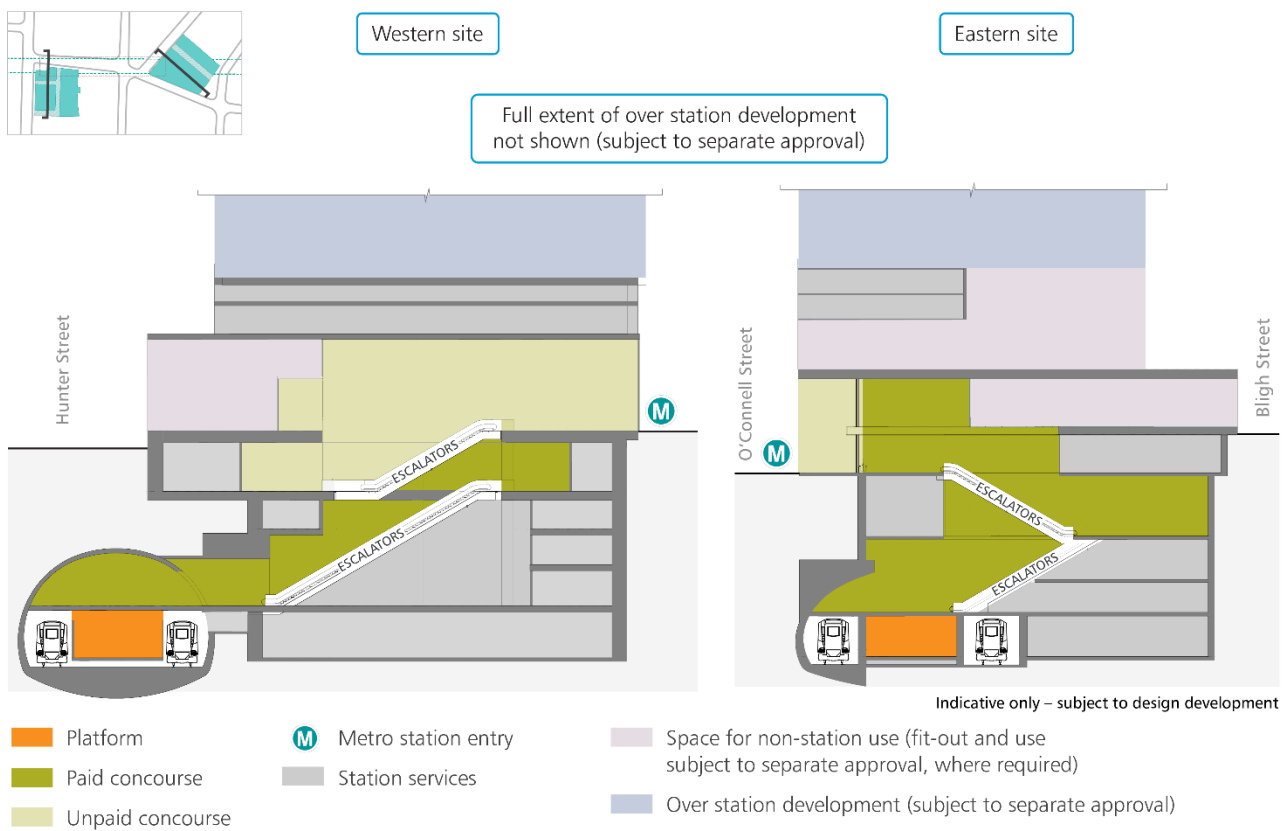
Indicative cross-sections - Hunter Street Station (Sydney CBD)
